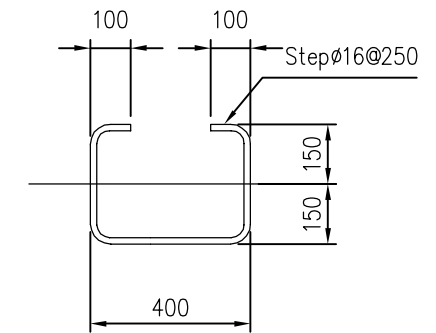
DETAIL OF HEAD CAP OF STEEL SHEET PILE
